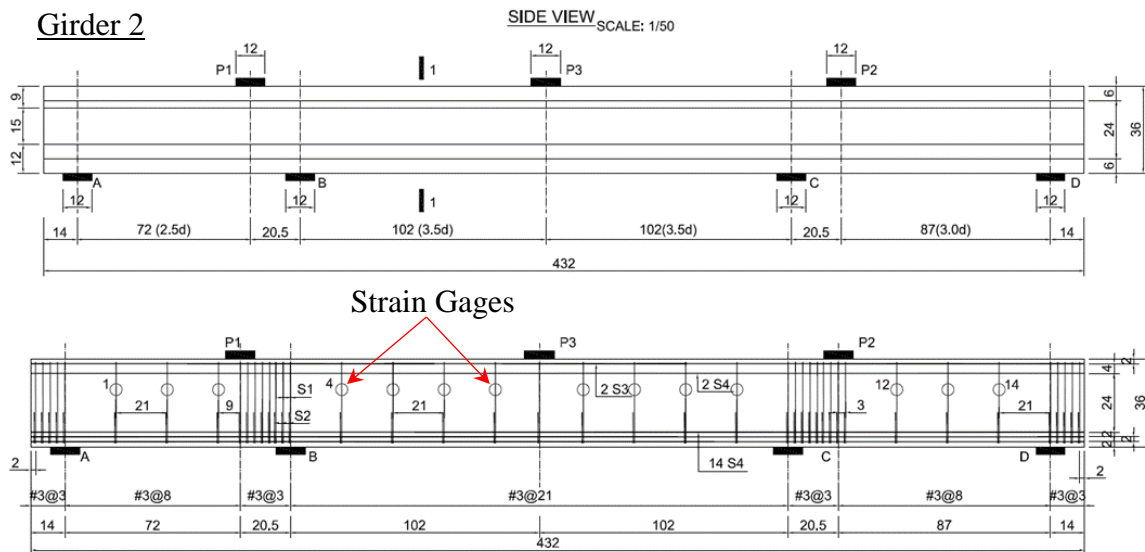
Girder 2 layout and strain gage locations (dimensions in inches)
